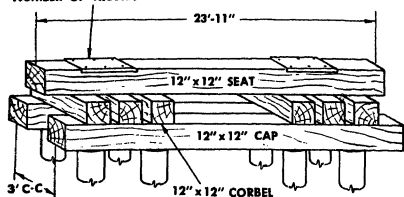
Construction of pile caps for intermediate supports under panel bridges without end posts or bearings. Cap for double trestle or pile bent.
